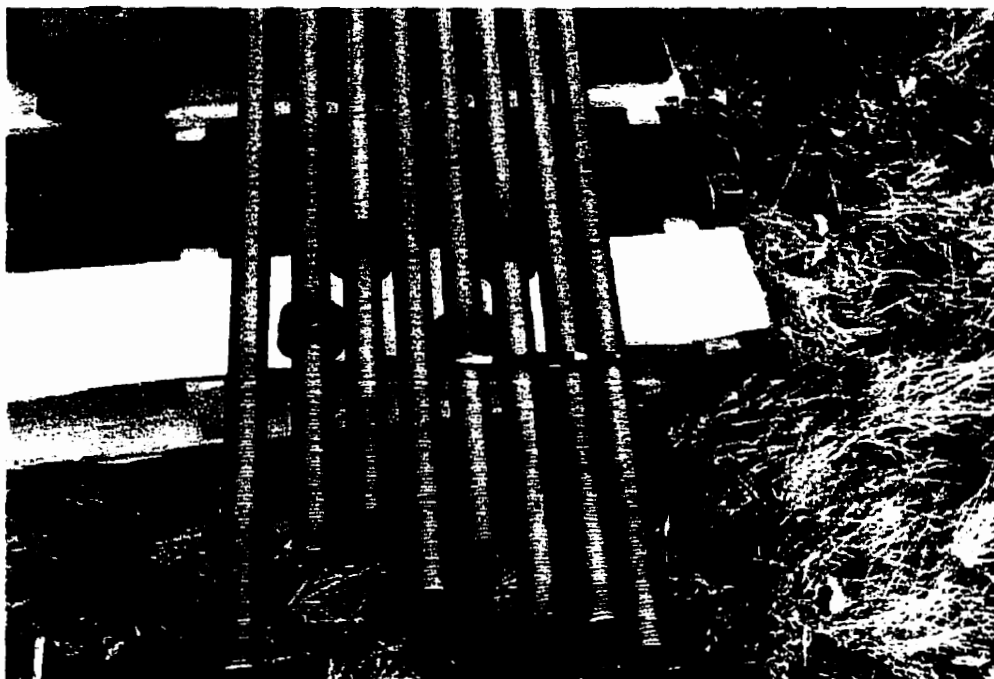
Steel Bars Used to Connect the Reaction Beam to the Test Pile
